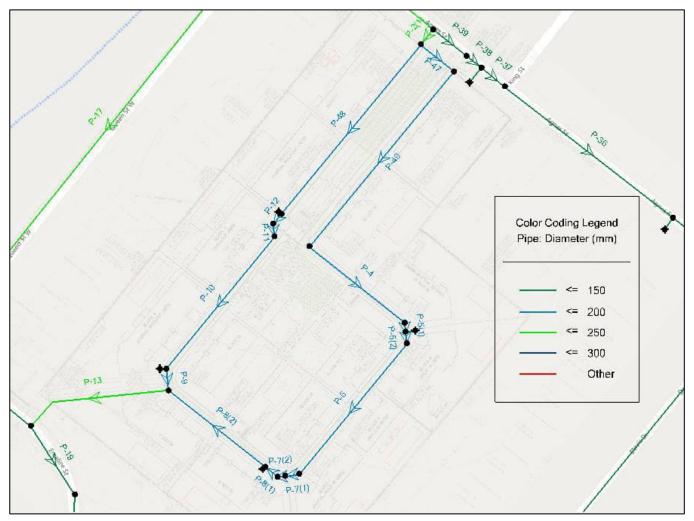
Agnes St Subdivision (Close-Up) Layout with Pipe IDs
